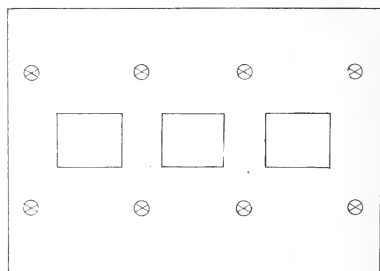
TYPICAL LAYOUT FOR CALENDERS.
